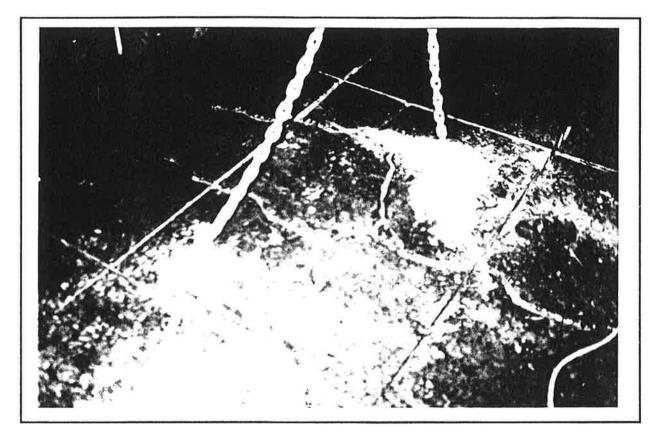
SECTION OF CONCRETE PRIOR TO REMOVAL FROM DRIP PAD
